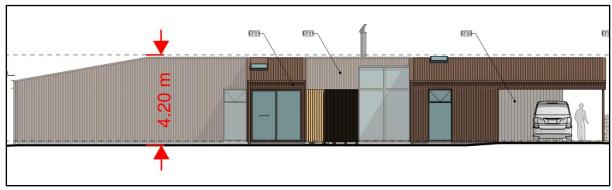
Excerpt of the South Elevation showing the height of the proposed dwelling.
